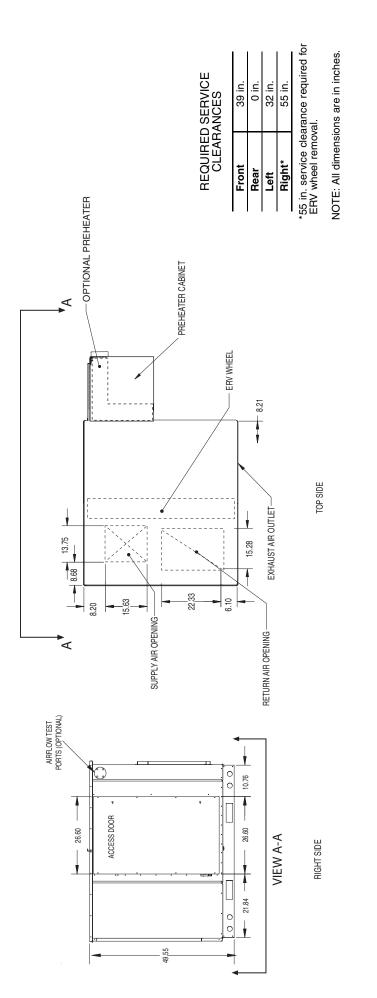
62MD, ME040 Outdoor Unit Dimensions
